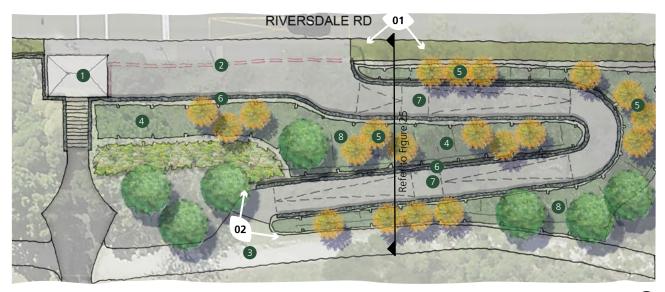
Riversdale Road and Alandale Street tram shelter detail area plan.
